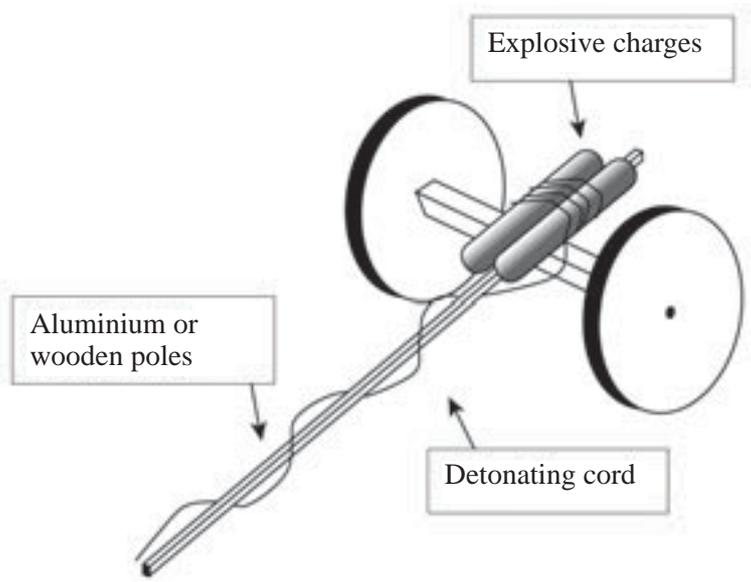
Use of a buggy to drive explosive charges up an ore pass, after Hadjigeorgiou and Lessard (2004)
